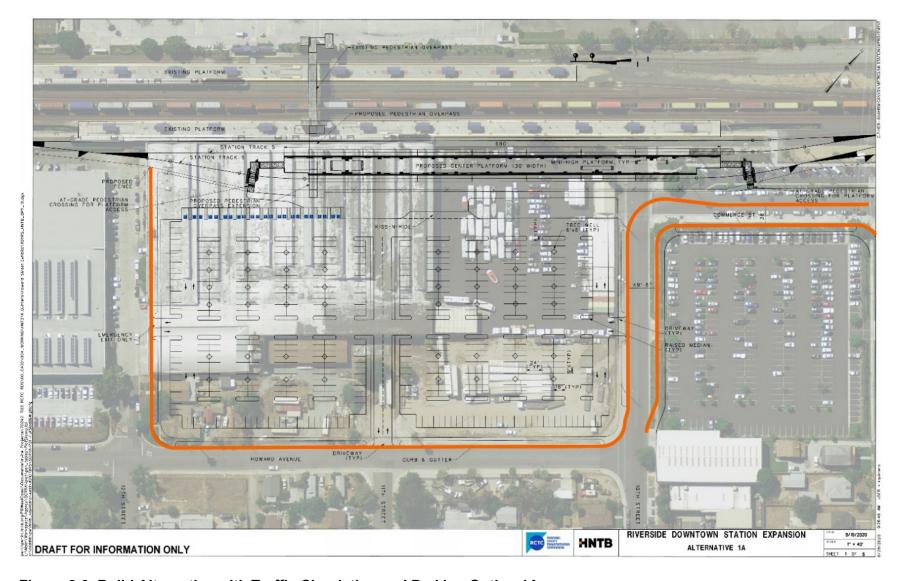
Build Alternative with Traffic Circulation and Parking Option 1A
